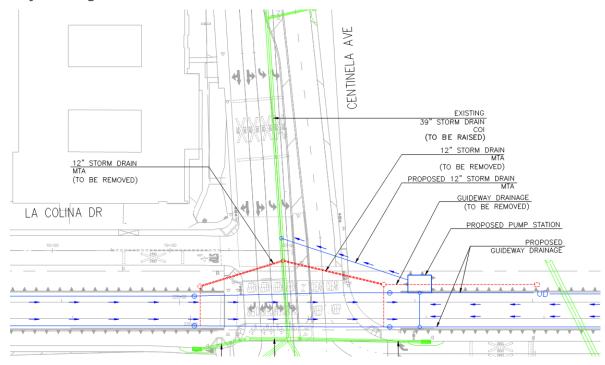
Alternative 2 – Proposed Pump Station Location and Additional Key Drainage Modifications
